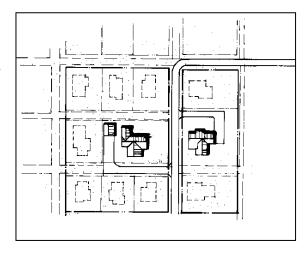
Building placement on rural lots (darker lines), such that any potential re-subdivision of the property would not be limited by proposed current building placement, or require the future demolition of buildings to be constructed in the proposed rural plat. In this example buildings are placed on rural lots such that they can remain on larger corner or mid-block lots of potential future re-subdivision (lighter lines).
